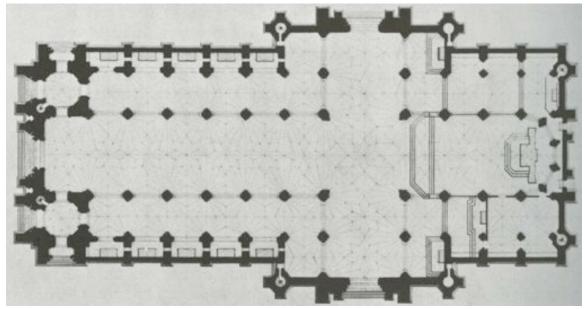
Plan for St. Patrick's Cathedral as built by Renwick.
